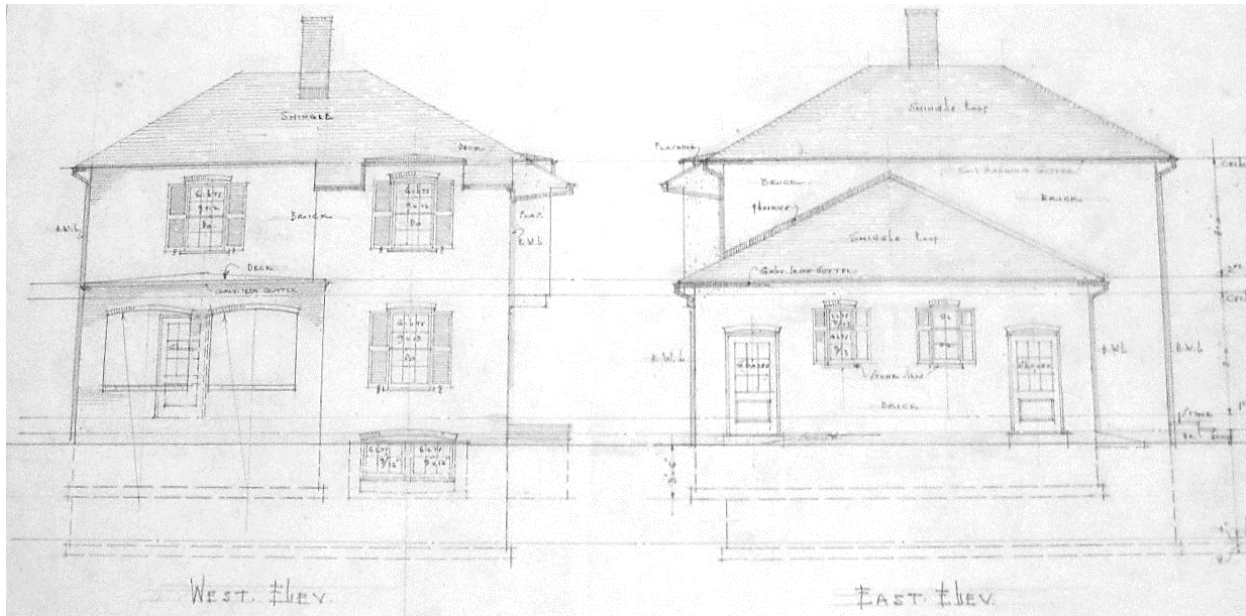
Julius & Carrie Feiss Garage Residence, 1681 Wood Road (#14), West & East Elevations
